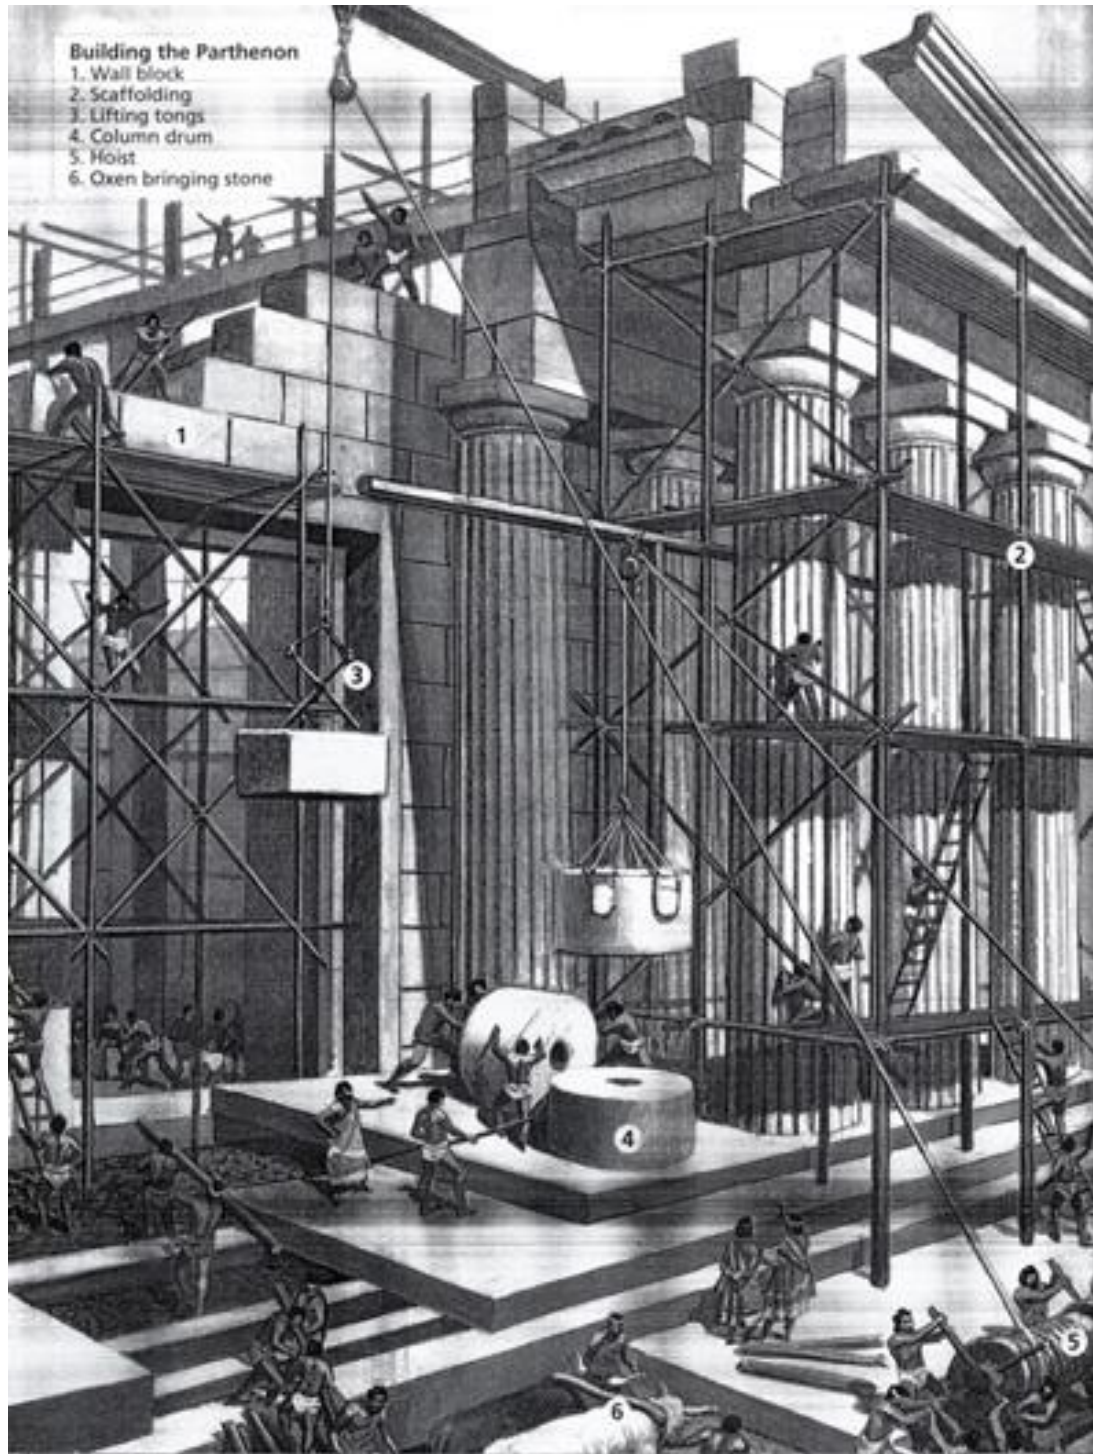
Building the Parthenon - 1.Wall block 2.Scaffolding 3.Lifting tongs 4.Column drum 5.Hoist 6.Oxen bring stone. (Source: Chrisp, P. *The Parthenon: how it was built and how it was used*, 1979, p. 23.)
